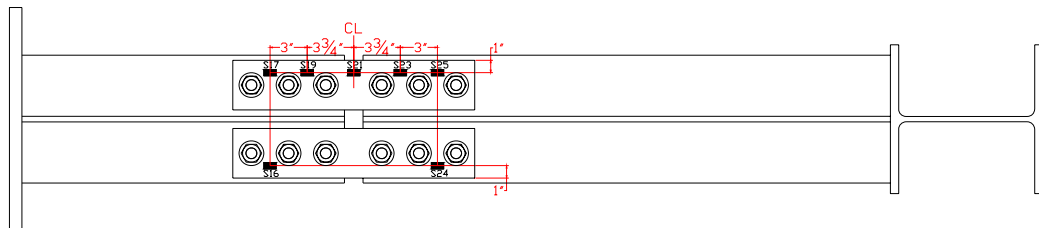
Specimen 2 – Instrumentation (Topside)
